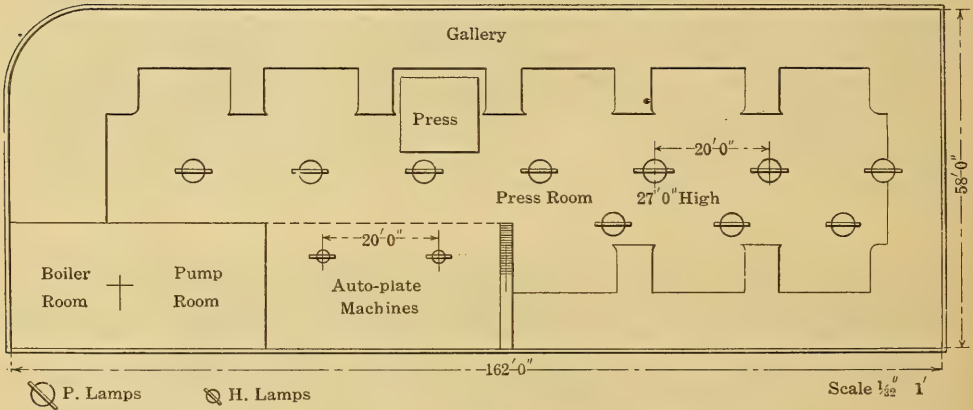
FLOOR PLAN. PRESS ROOM.
